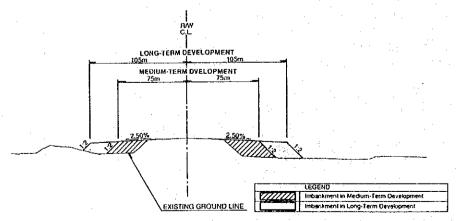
Phasing Plan for Grading of Runway Strip
